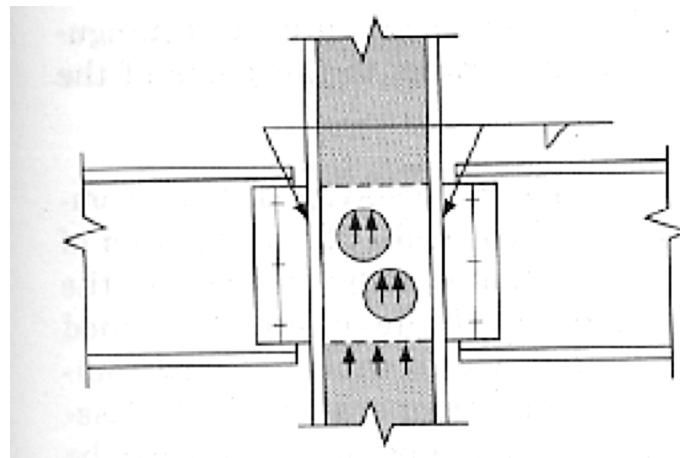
CFT Through Connection to Minimize Steel Bearing
